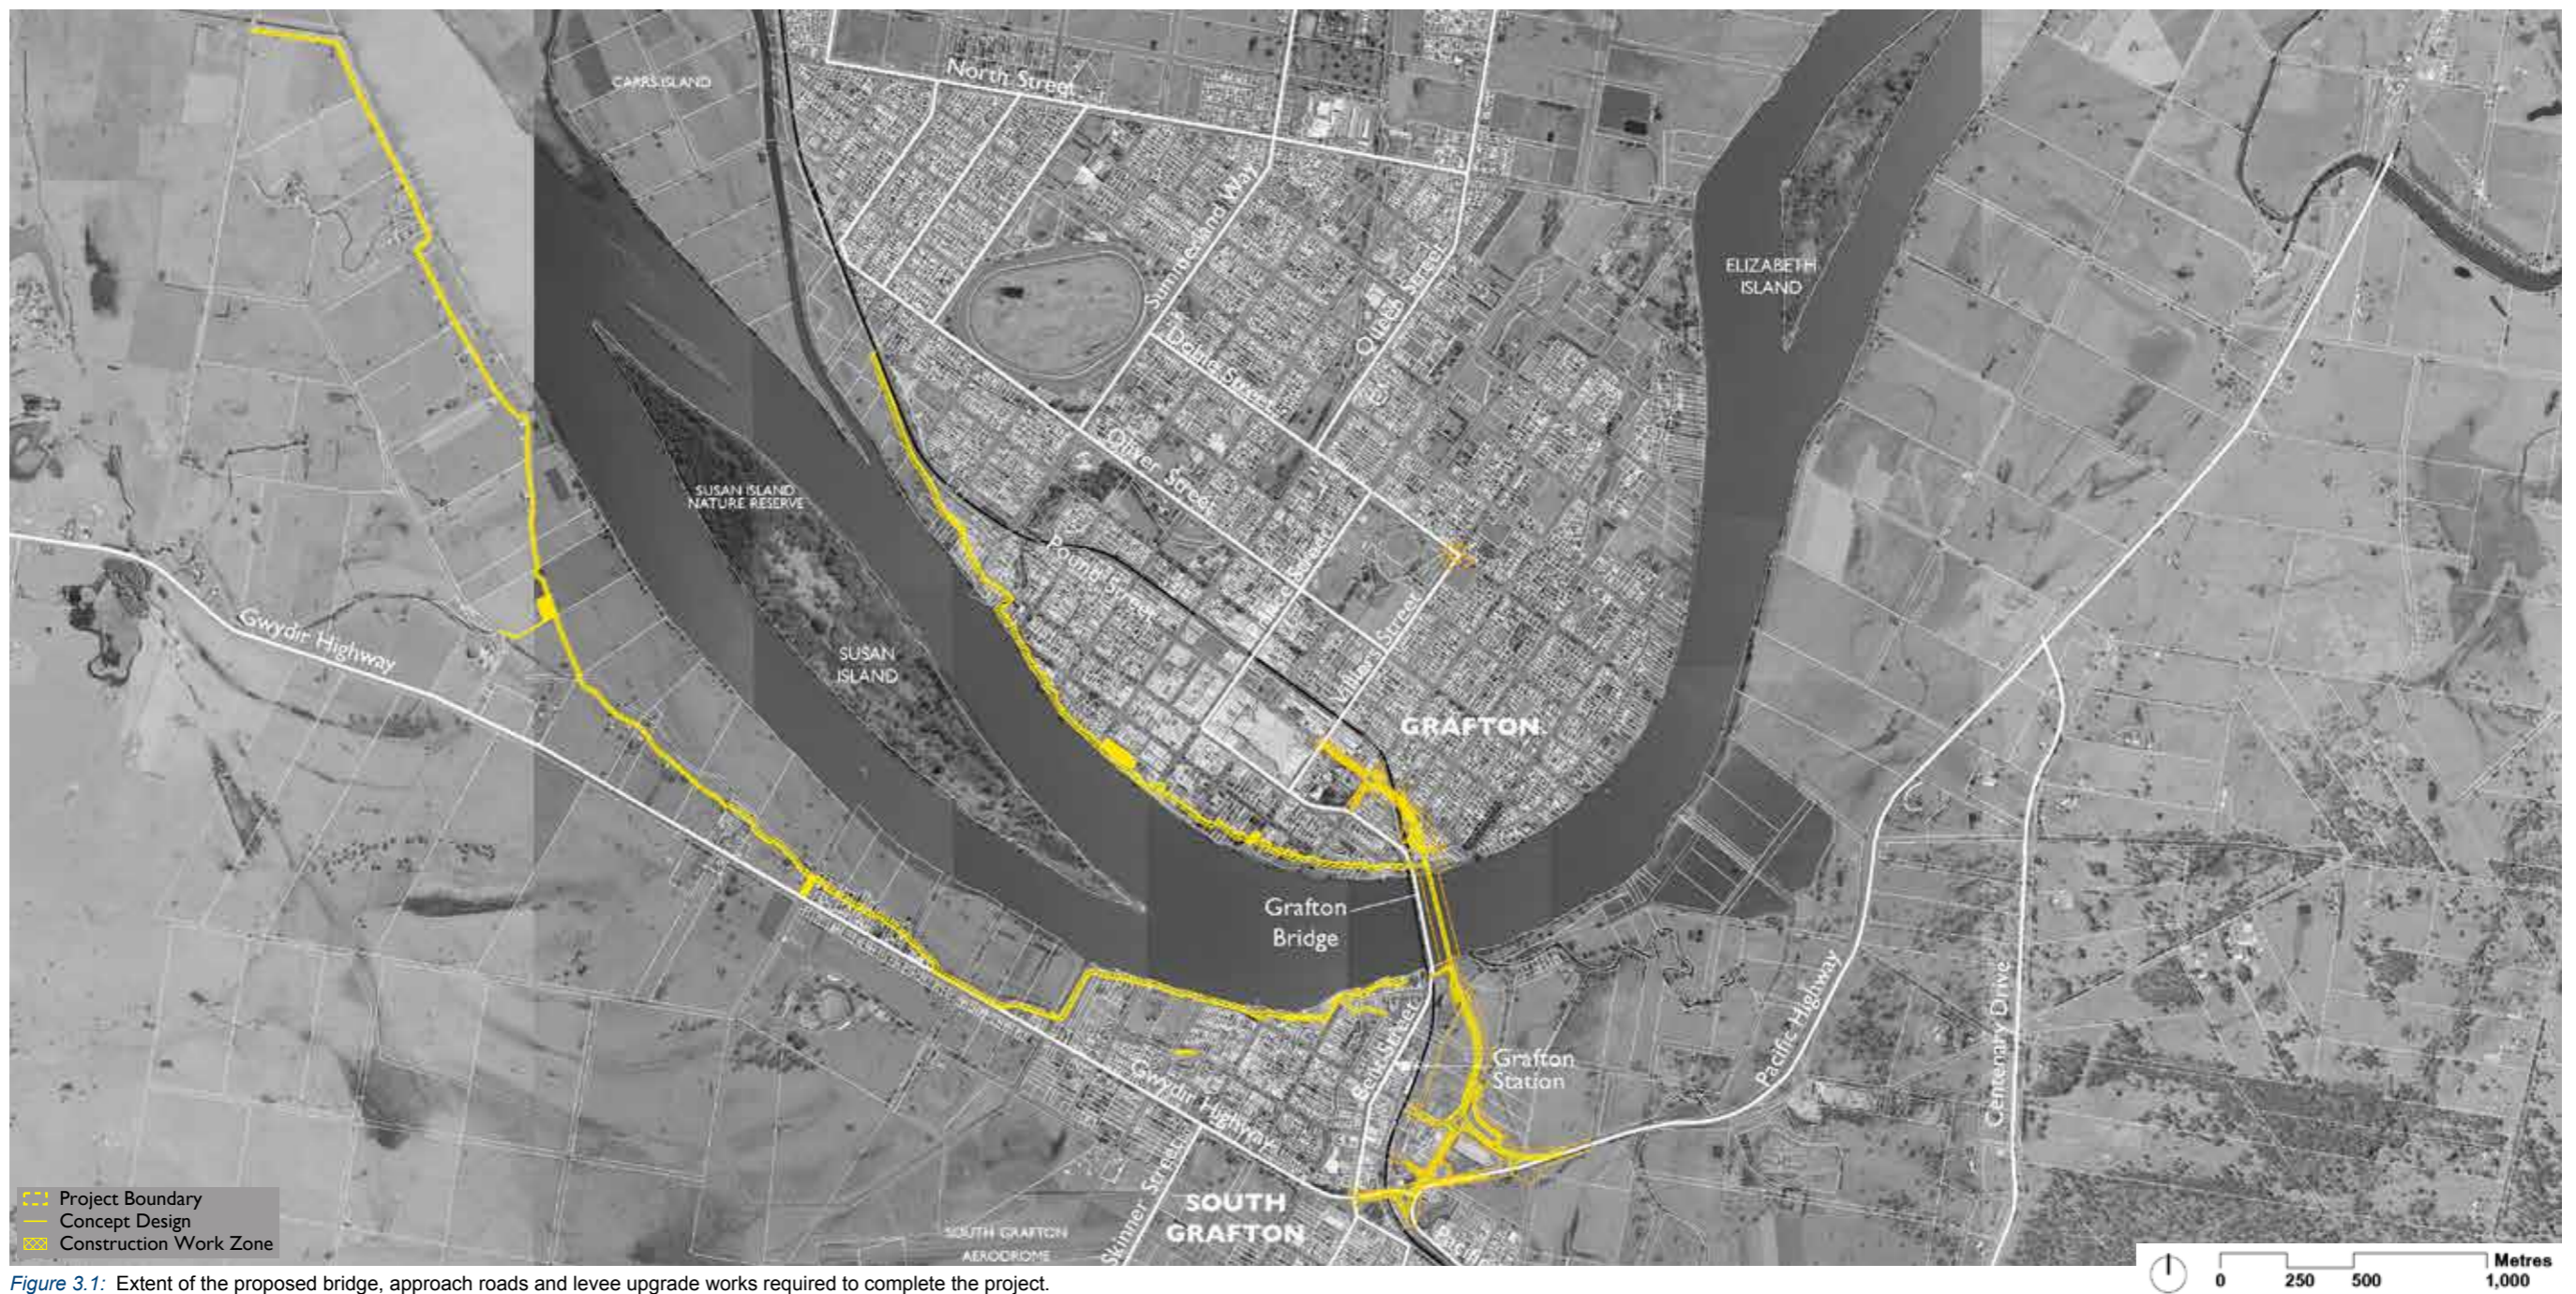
Extent of the proposed bridge, approach roads and levee upgrade works required to complete the project.
